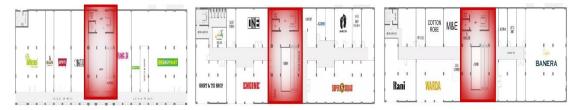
Floor Plans (Ground, F.F, Second Floor)
